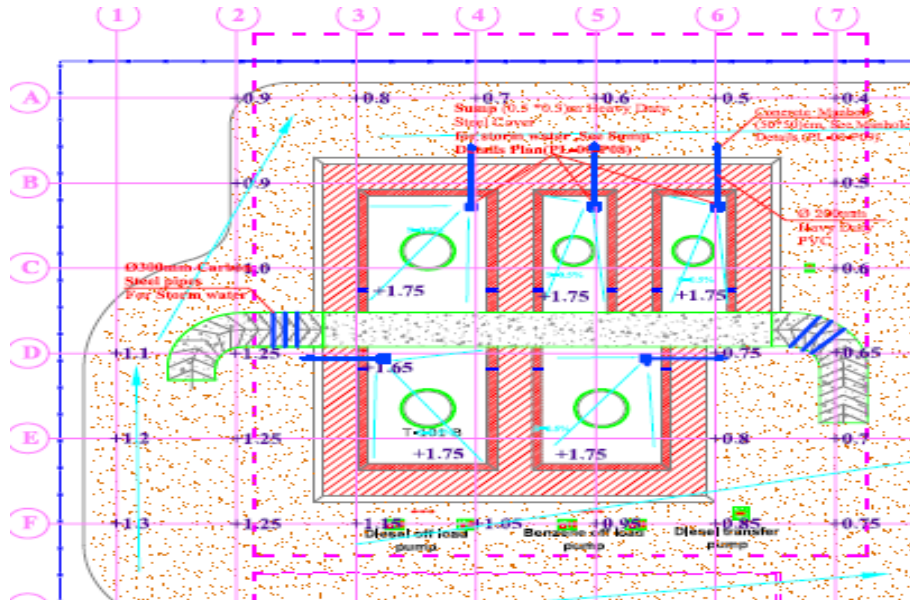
Site plan of POL platoon (Courtesy of USACE)
